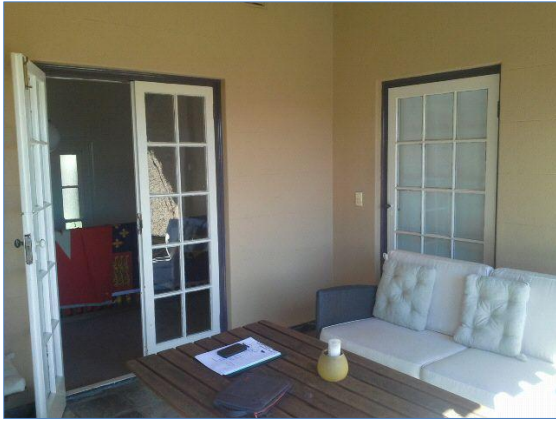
Interior throughout - Off white paint to walls, White lead based paint to doors, windows, frames and skirting boards
